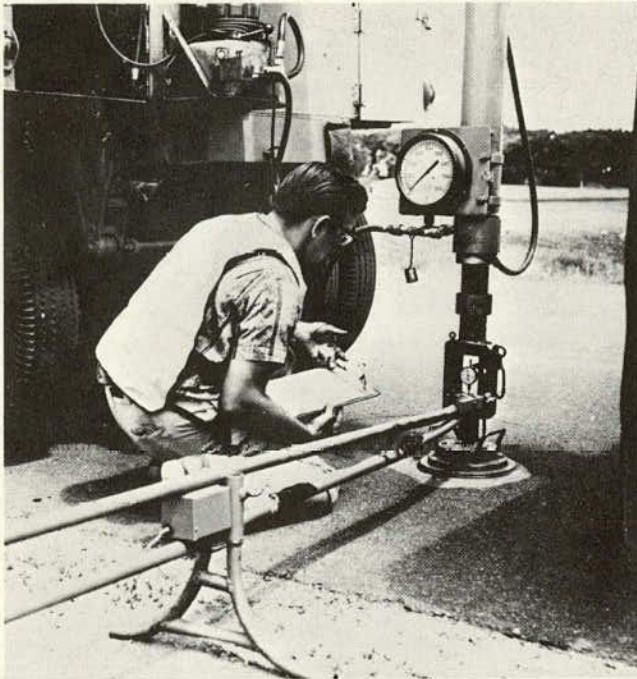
Plate bearing test equipment used by Minnesota Department of Highways. Truck and trailer supply load on 12-in. diameter plate.
